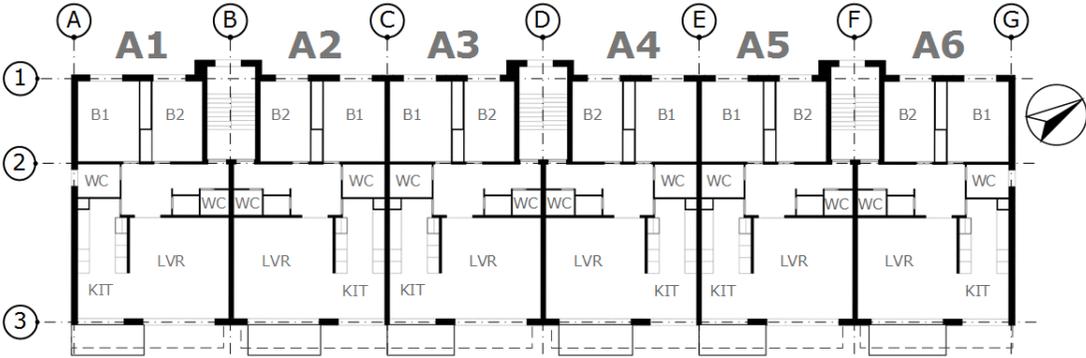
Floor plan, third floor, variable design (balcony placement)
